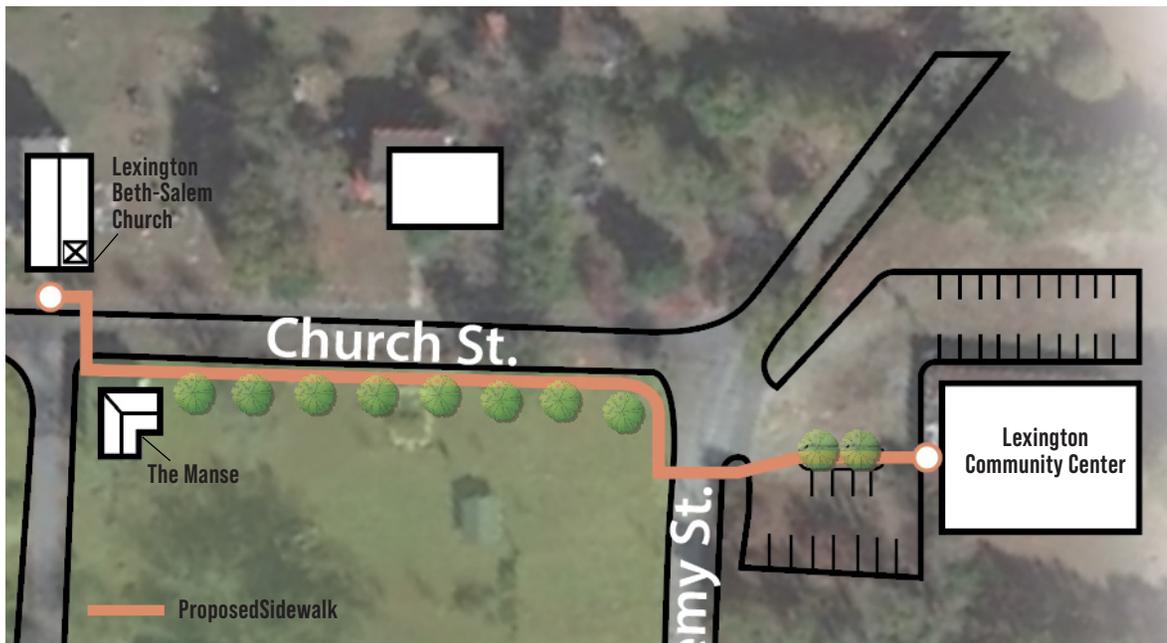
Example of a paved parking lot at the Lexington Community Center with a sidewalk connecting to the Lexington Beth-Salem Church
